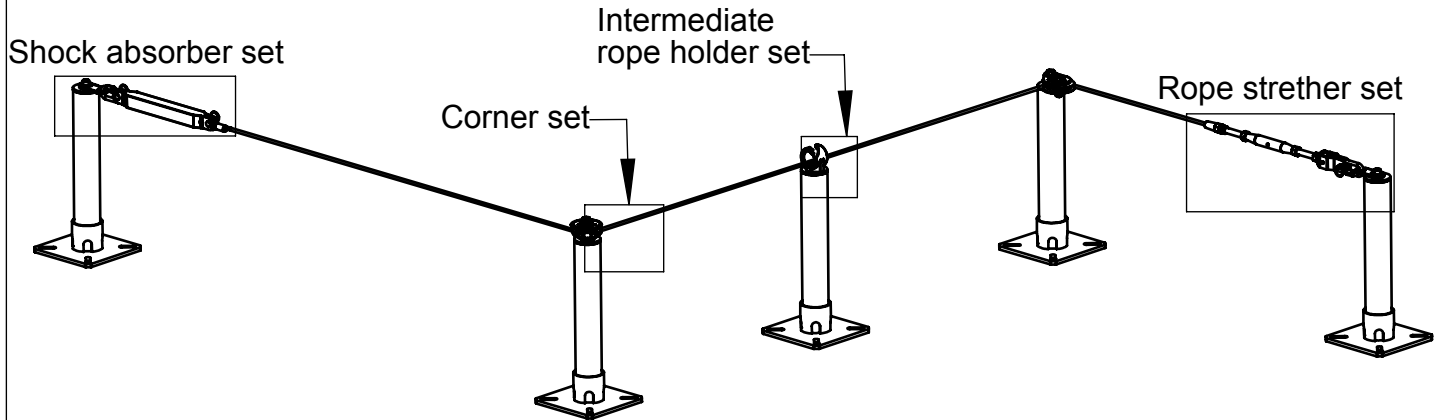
The PRIM system example of installation on the HL704 poles.
